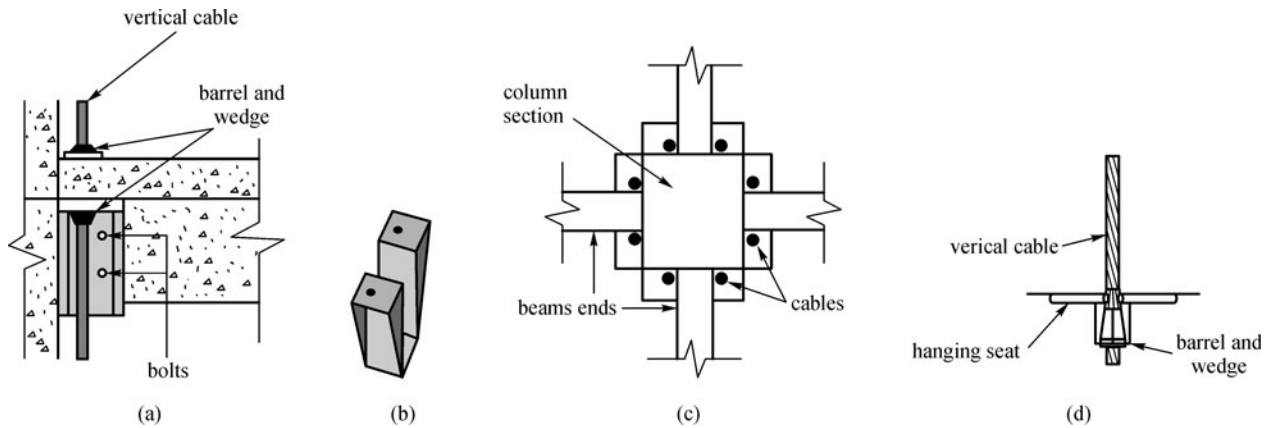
Steel plates are fabricated and welded to form a seating base to hang beam ends by the cables
